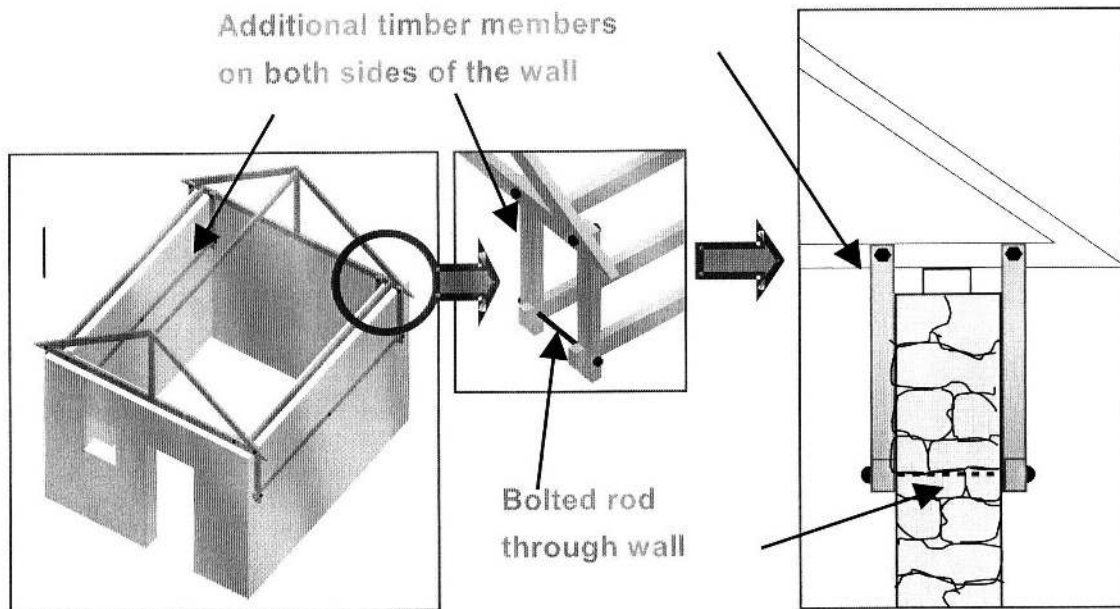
Roof-wall connection system using timber members (Drawings by: Yanni Loukissas).
